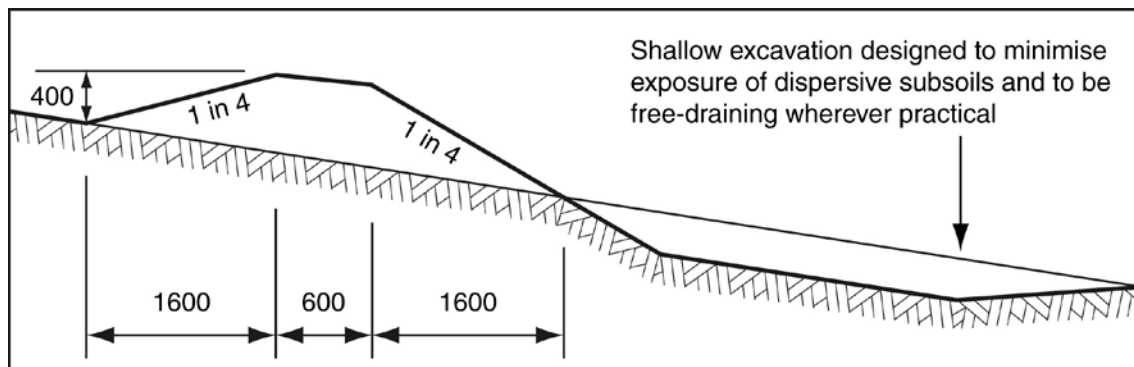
Alternative trafficable cross bank (berm) construction (narrow)
